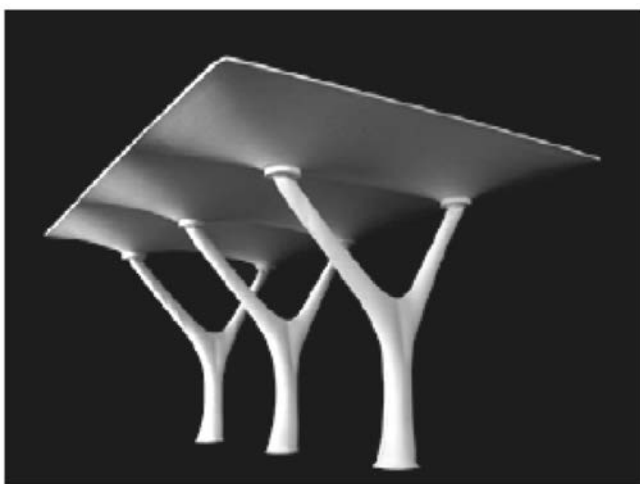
New architectural and sculptural possibilities with fabric formwork (West 2006)
